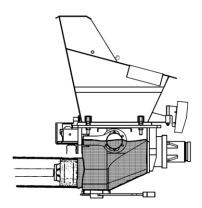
Always fill the hopper with concrete up to the mixer shaft
